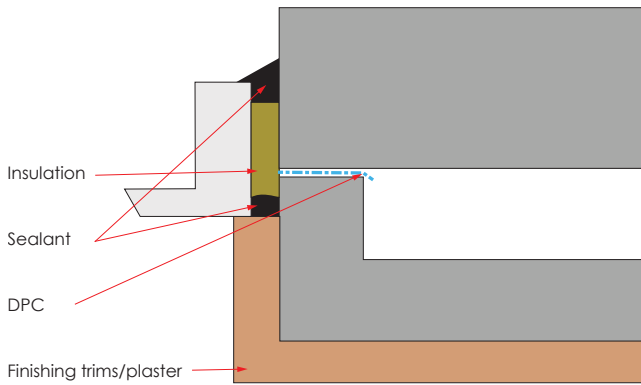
Flush reveal with joint width less than 6mm and frame bridging DPC
